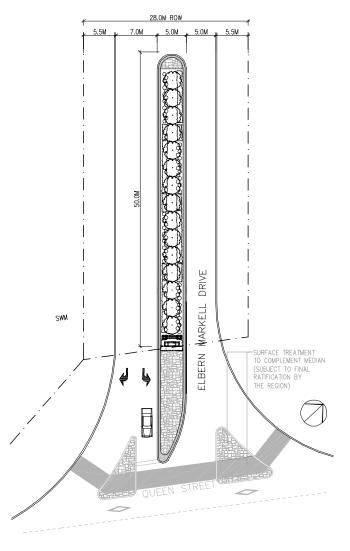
Concept Plan of Primary Gateway Feature #3
